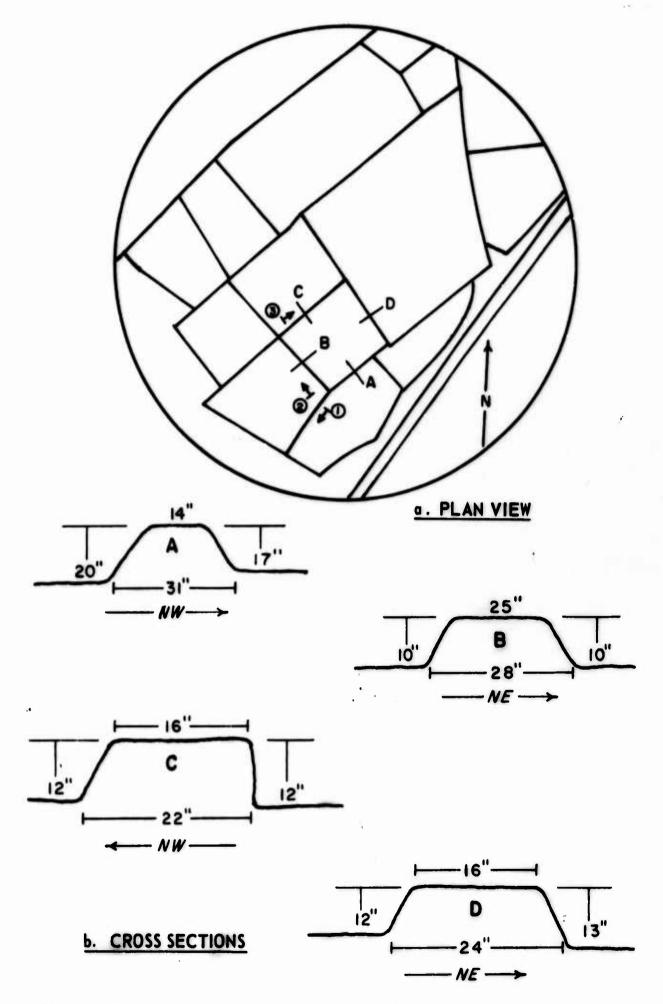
Paddies with random arrangement--dike plan view and cross sections at site SG-60 (September 1964)
